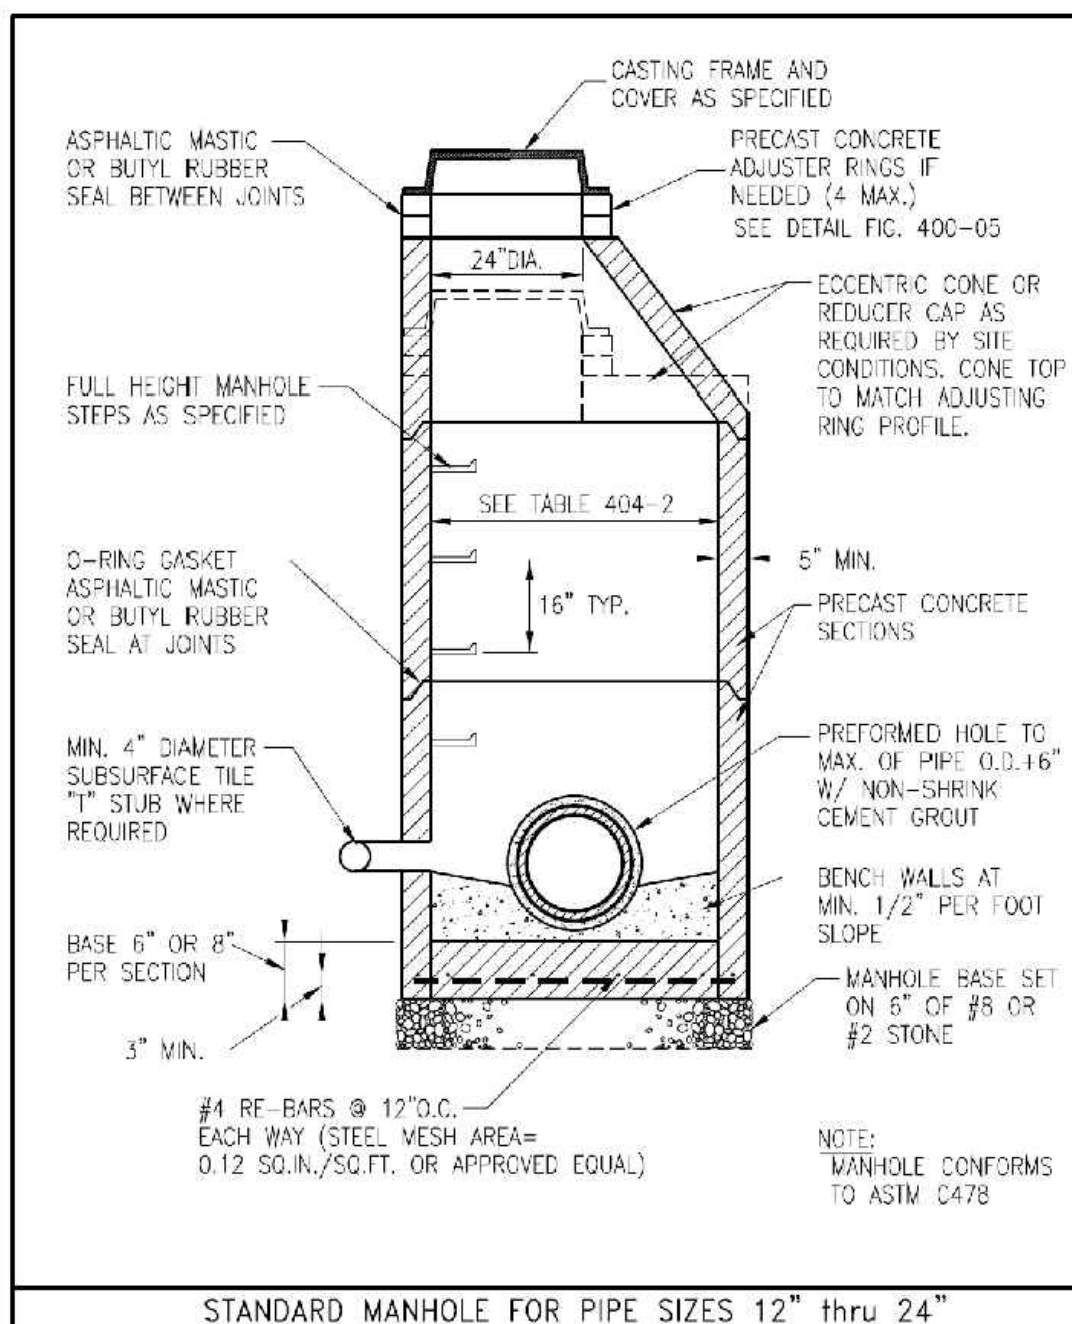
Standard Manhole for Pipe Sized 12" thru 24"
